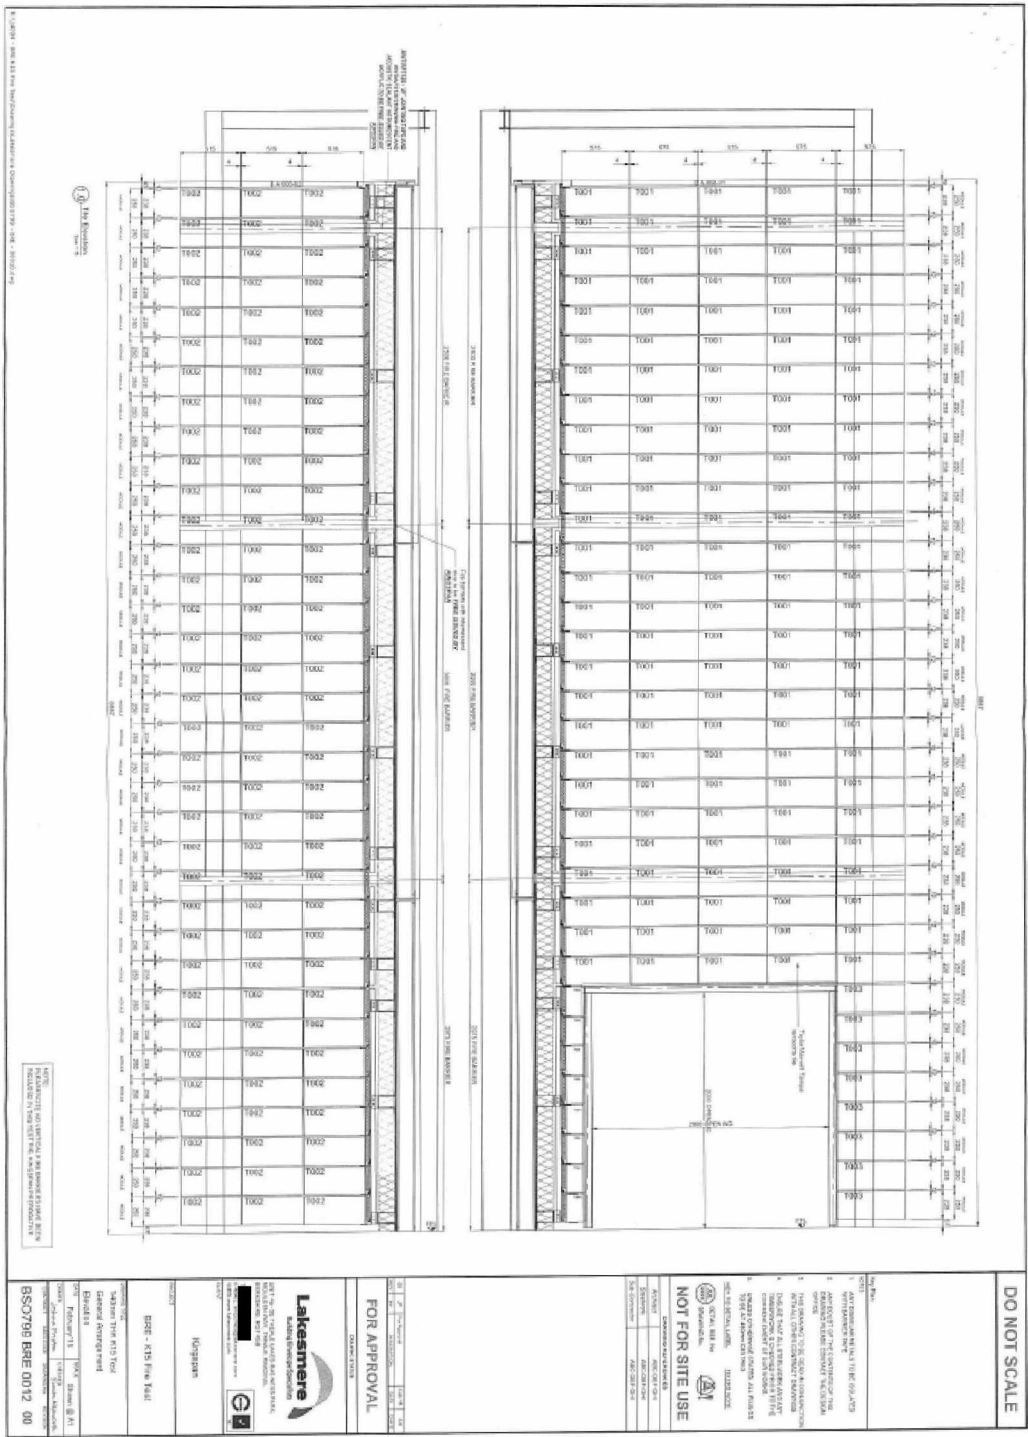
Construction of the System showing the layout of the Terracotta tiles
